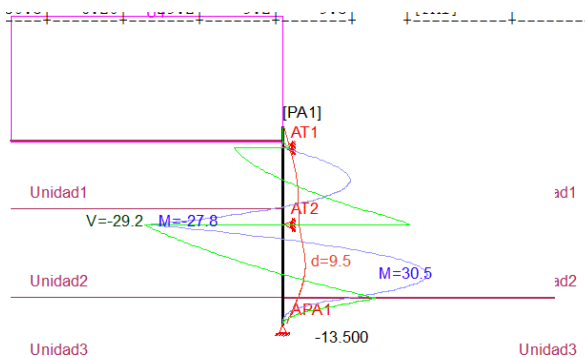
Deformations (mm) and mechanical elements (Moment in t-m and Shear in t) in the construction stage of the Milan wall supported on struts.
